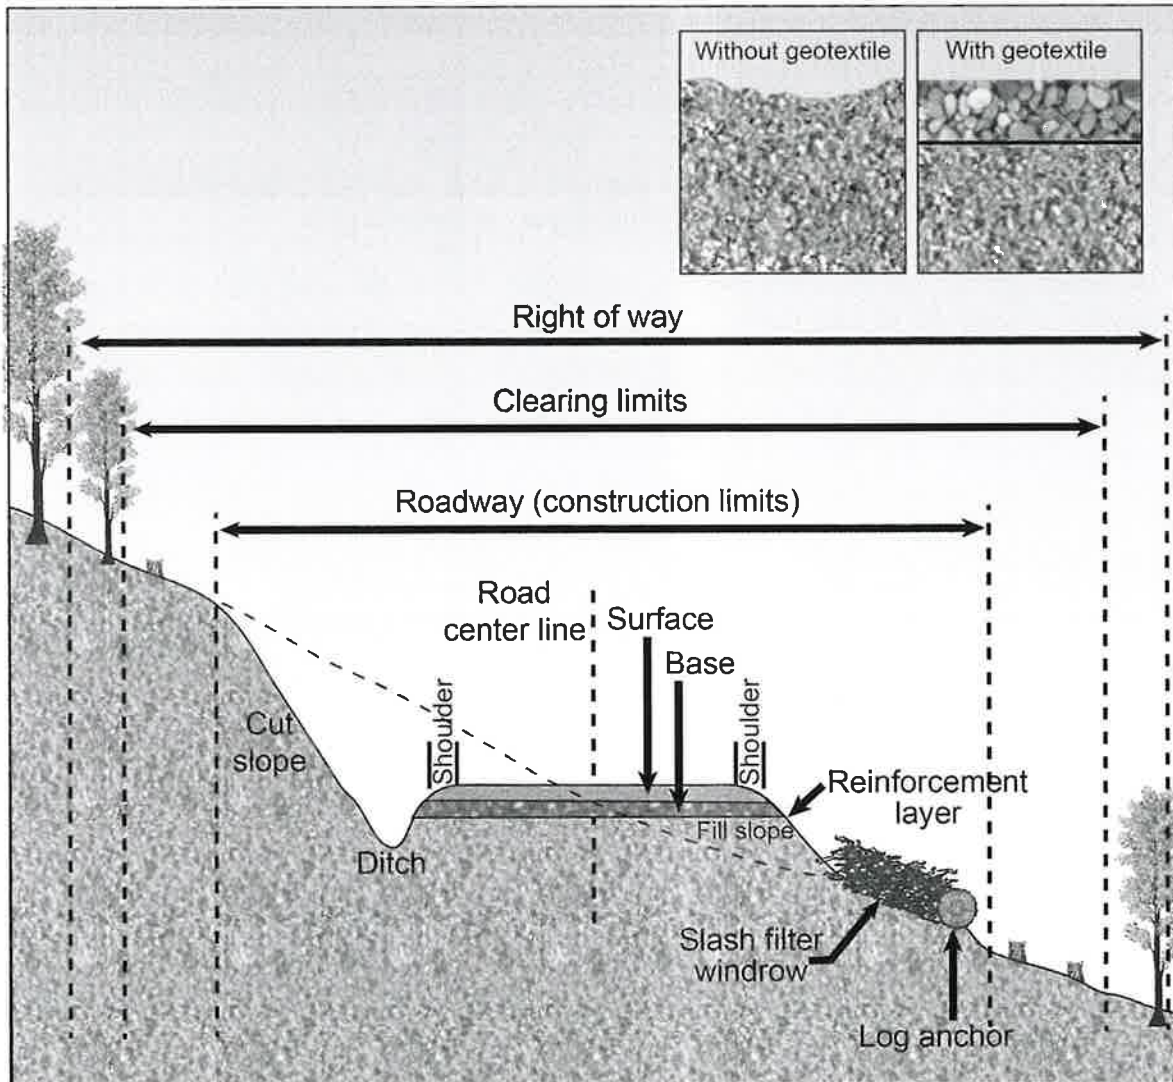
Typical cross section for new road construction (University of Idaho 2015).
